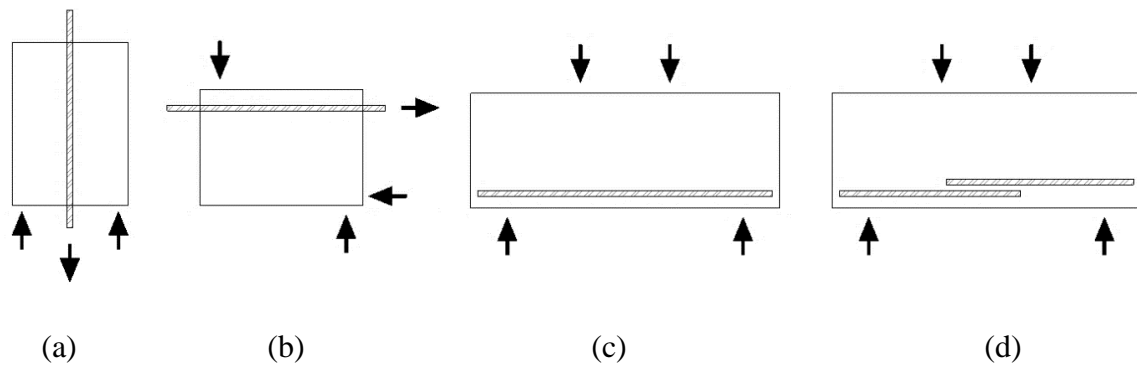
Different bond test methods for reinforcement in concrete: (a) pull-out; (b) beam-end; (c) simple beam; (d) splice.
